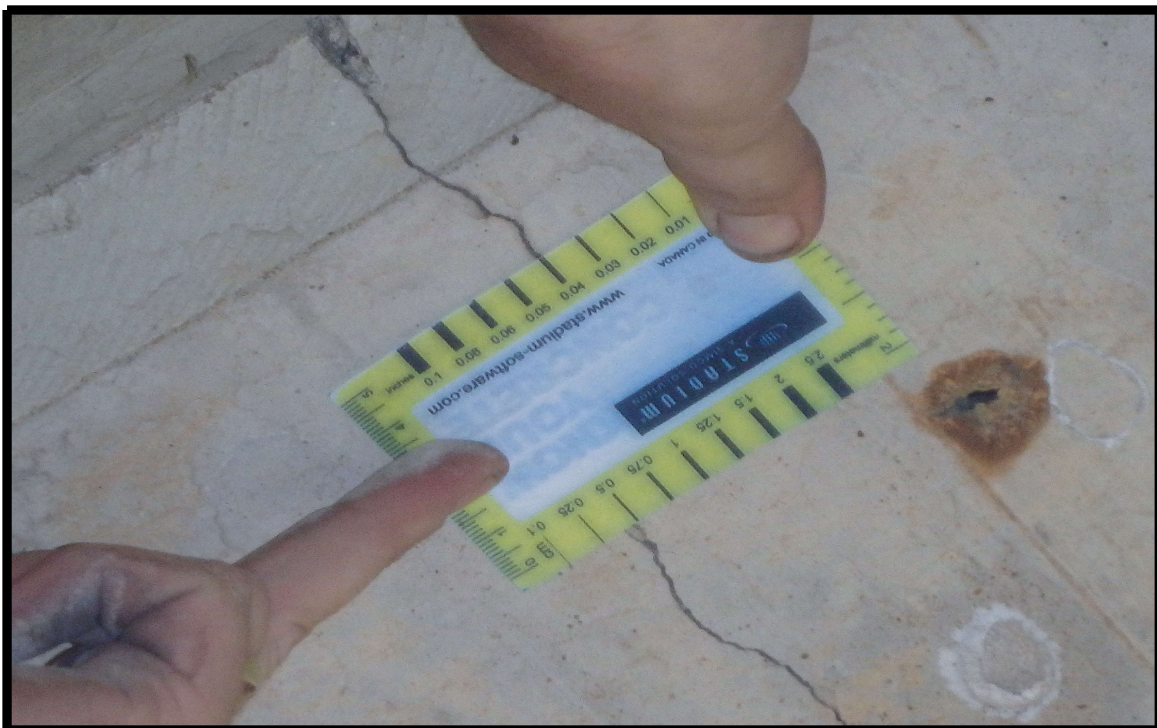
CRACK IN THE DOWSTREAM GIRDER
